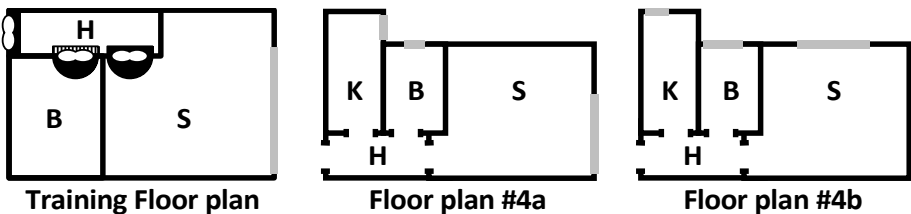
Virtual floor plans (with windows: gray shaded) used in Experiment 2
